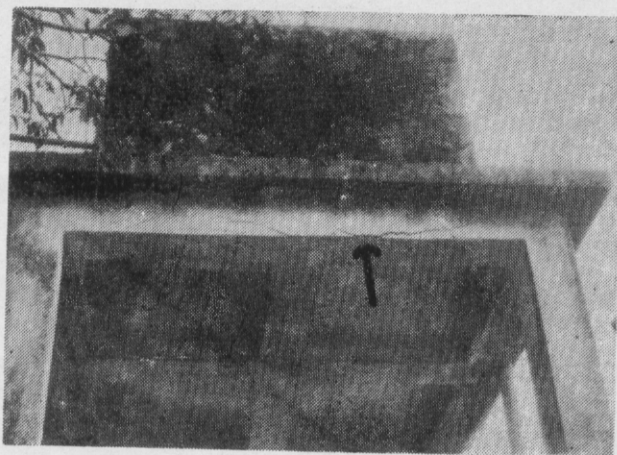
Damage to a tubular steel frame shed with brick masonry filler walls-the steel-barties have served as hinges for the broken wall.
